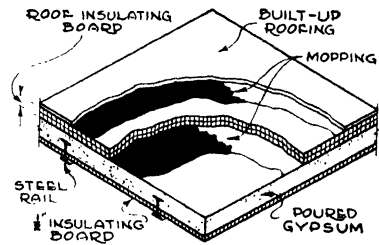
Poured Gypsum on Structural Insulating Board Roof Deck, Roof Insulation Board, and Built-up Roofing
